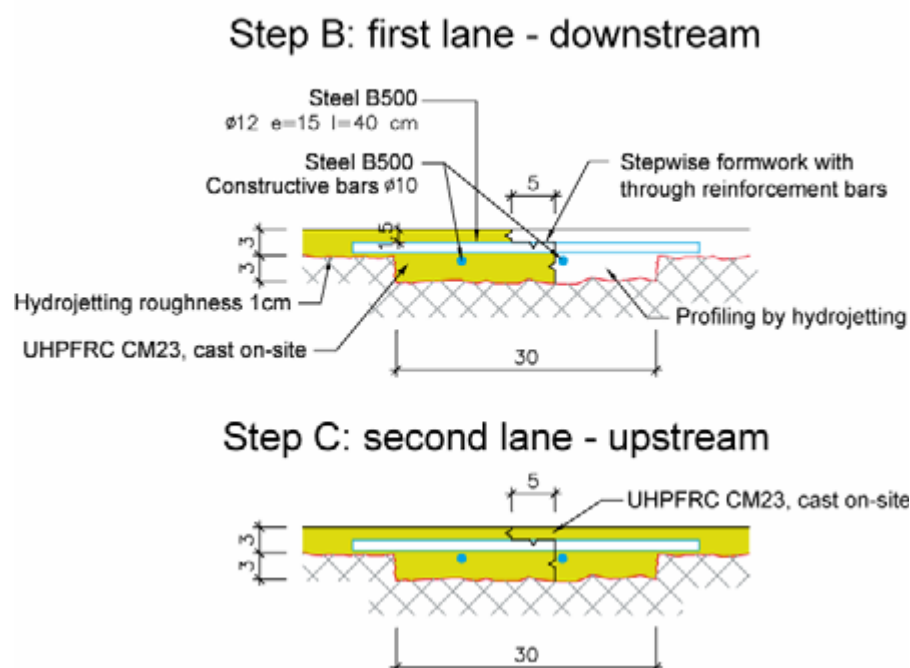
Longitudinal construction joint for the UHPFRC of the “Le Morge” bridge deck, SAMARIS.
